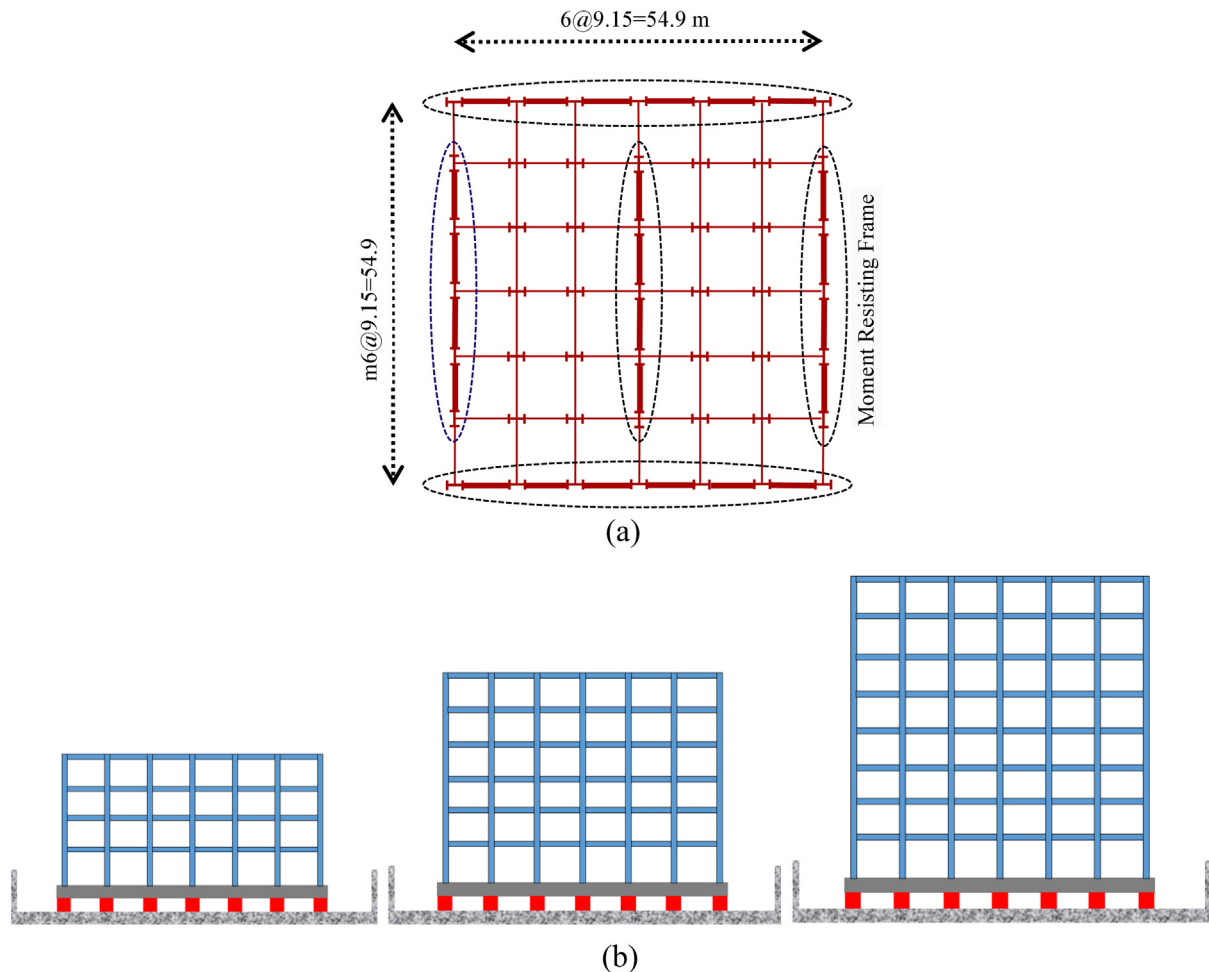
(a) Plan of the studied structures, (b) elevation view of the structures.
